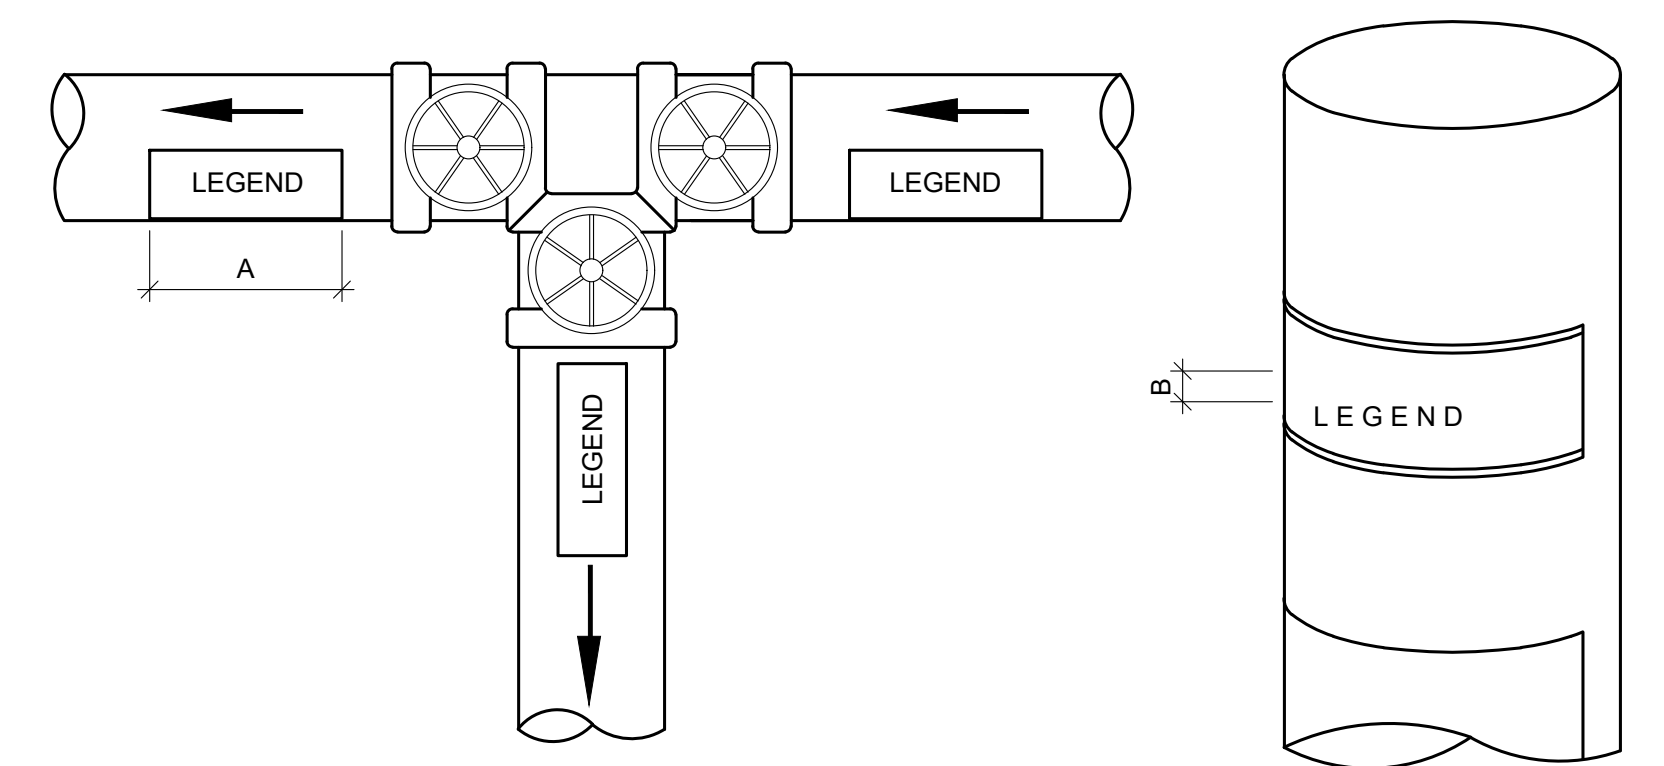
TYPICAL LEGEND LABELING DETAIL
